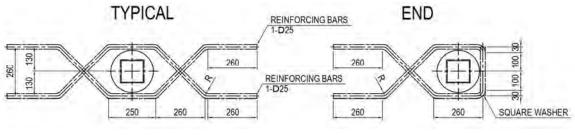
Detailed Plan of Guardrail (Outer Side)
